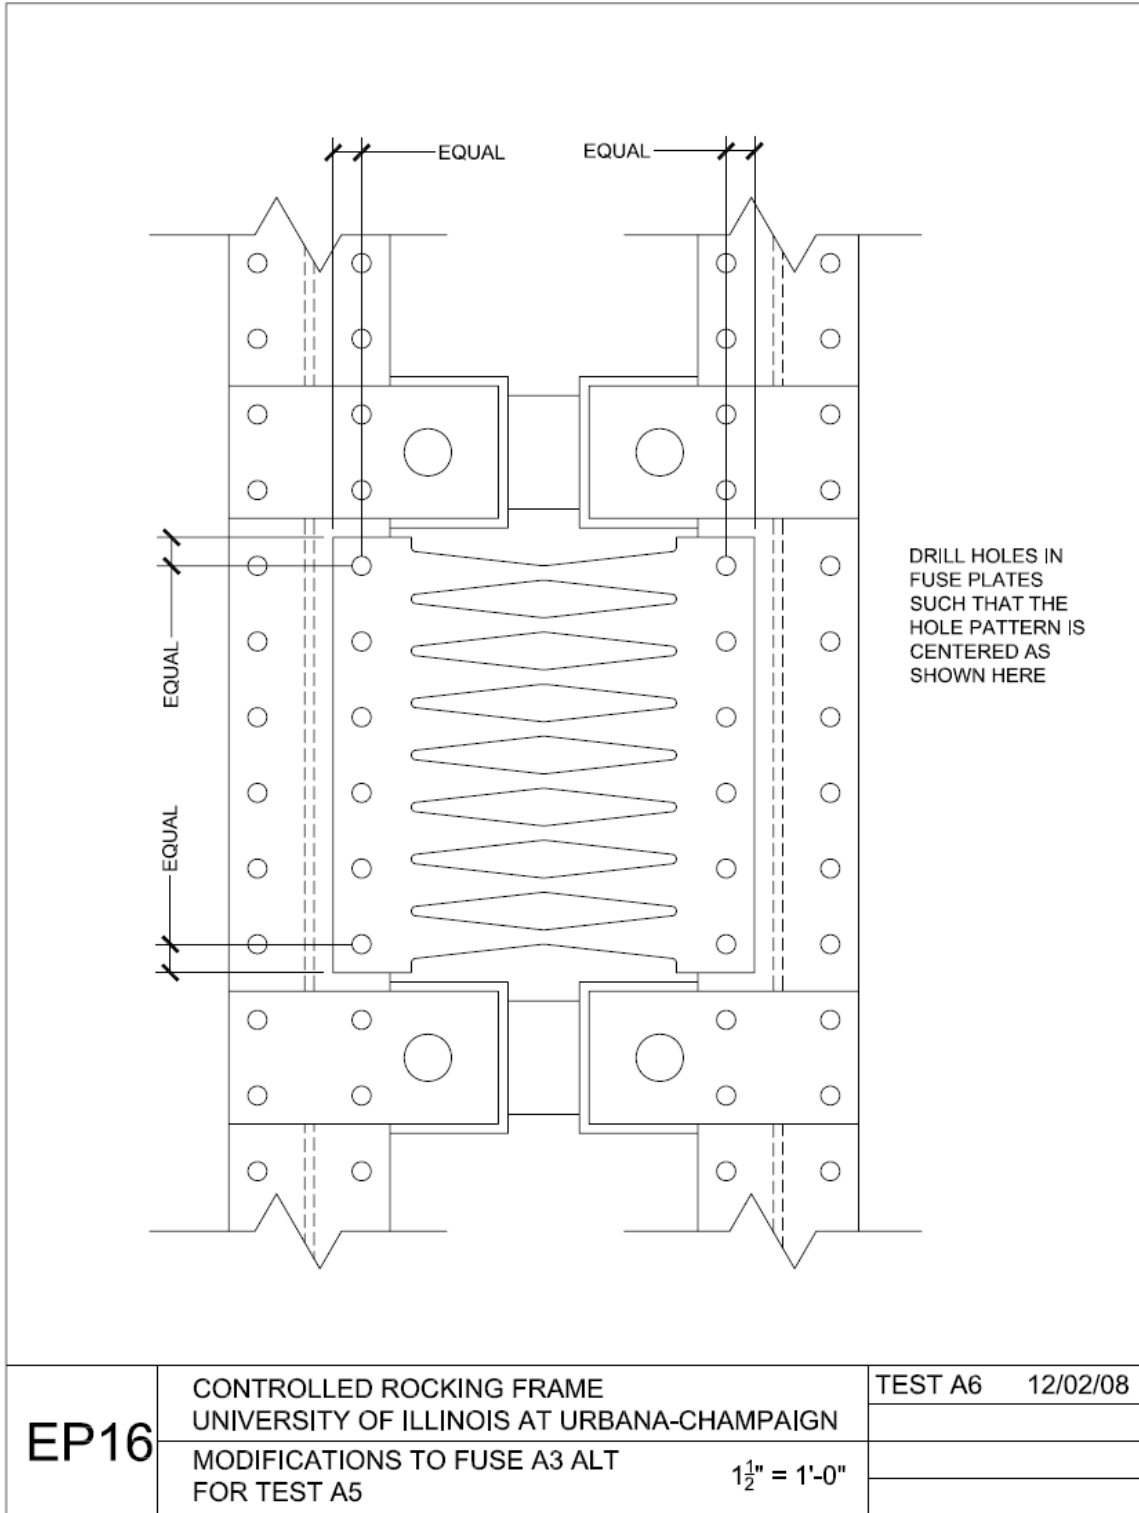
Erection Plan Drawing for Specimen A6 Fuse
